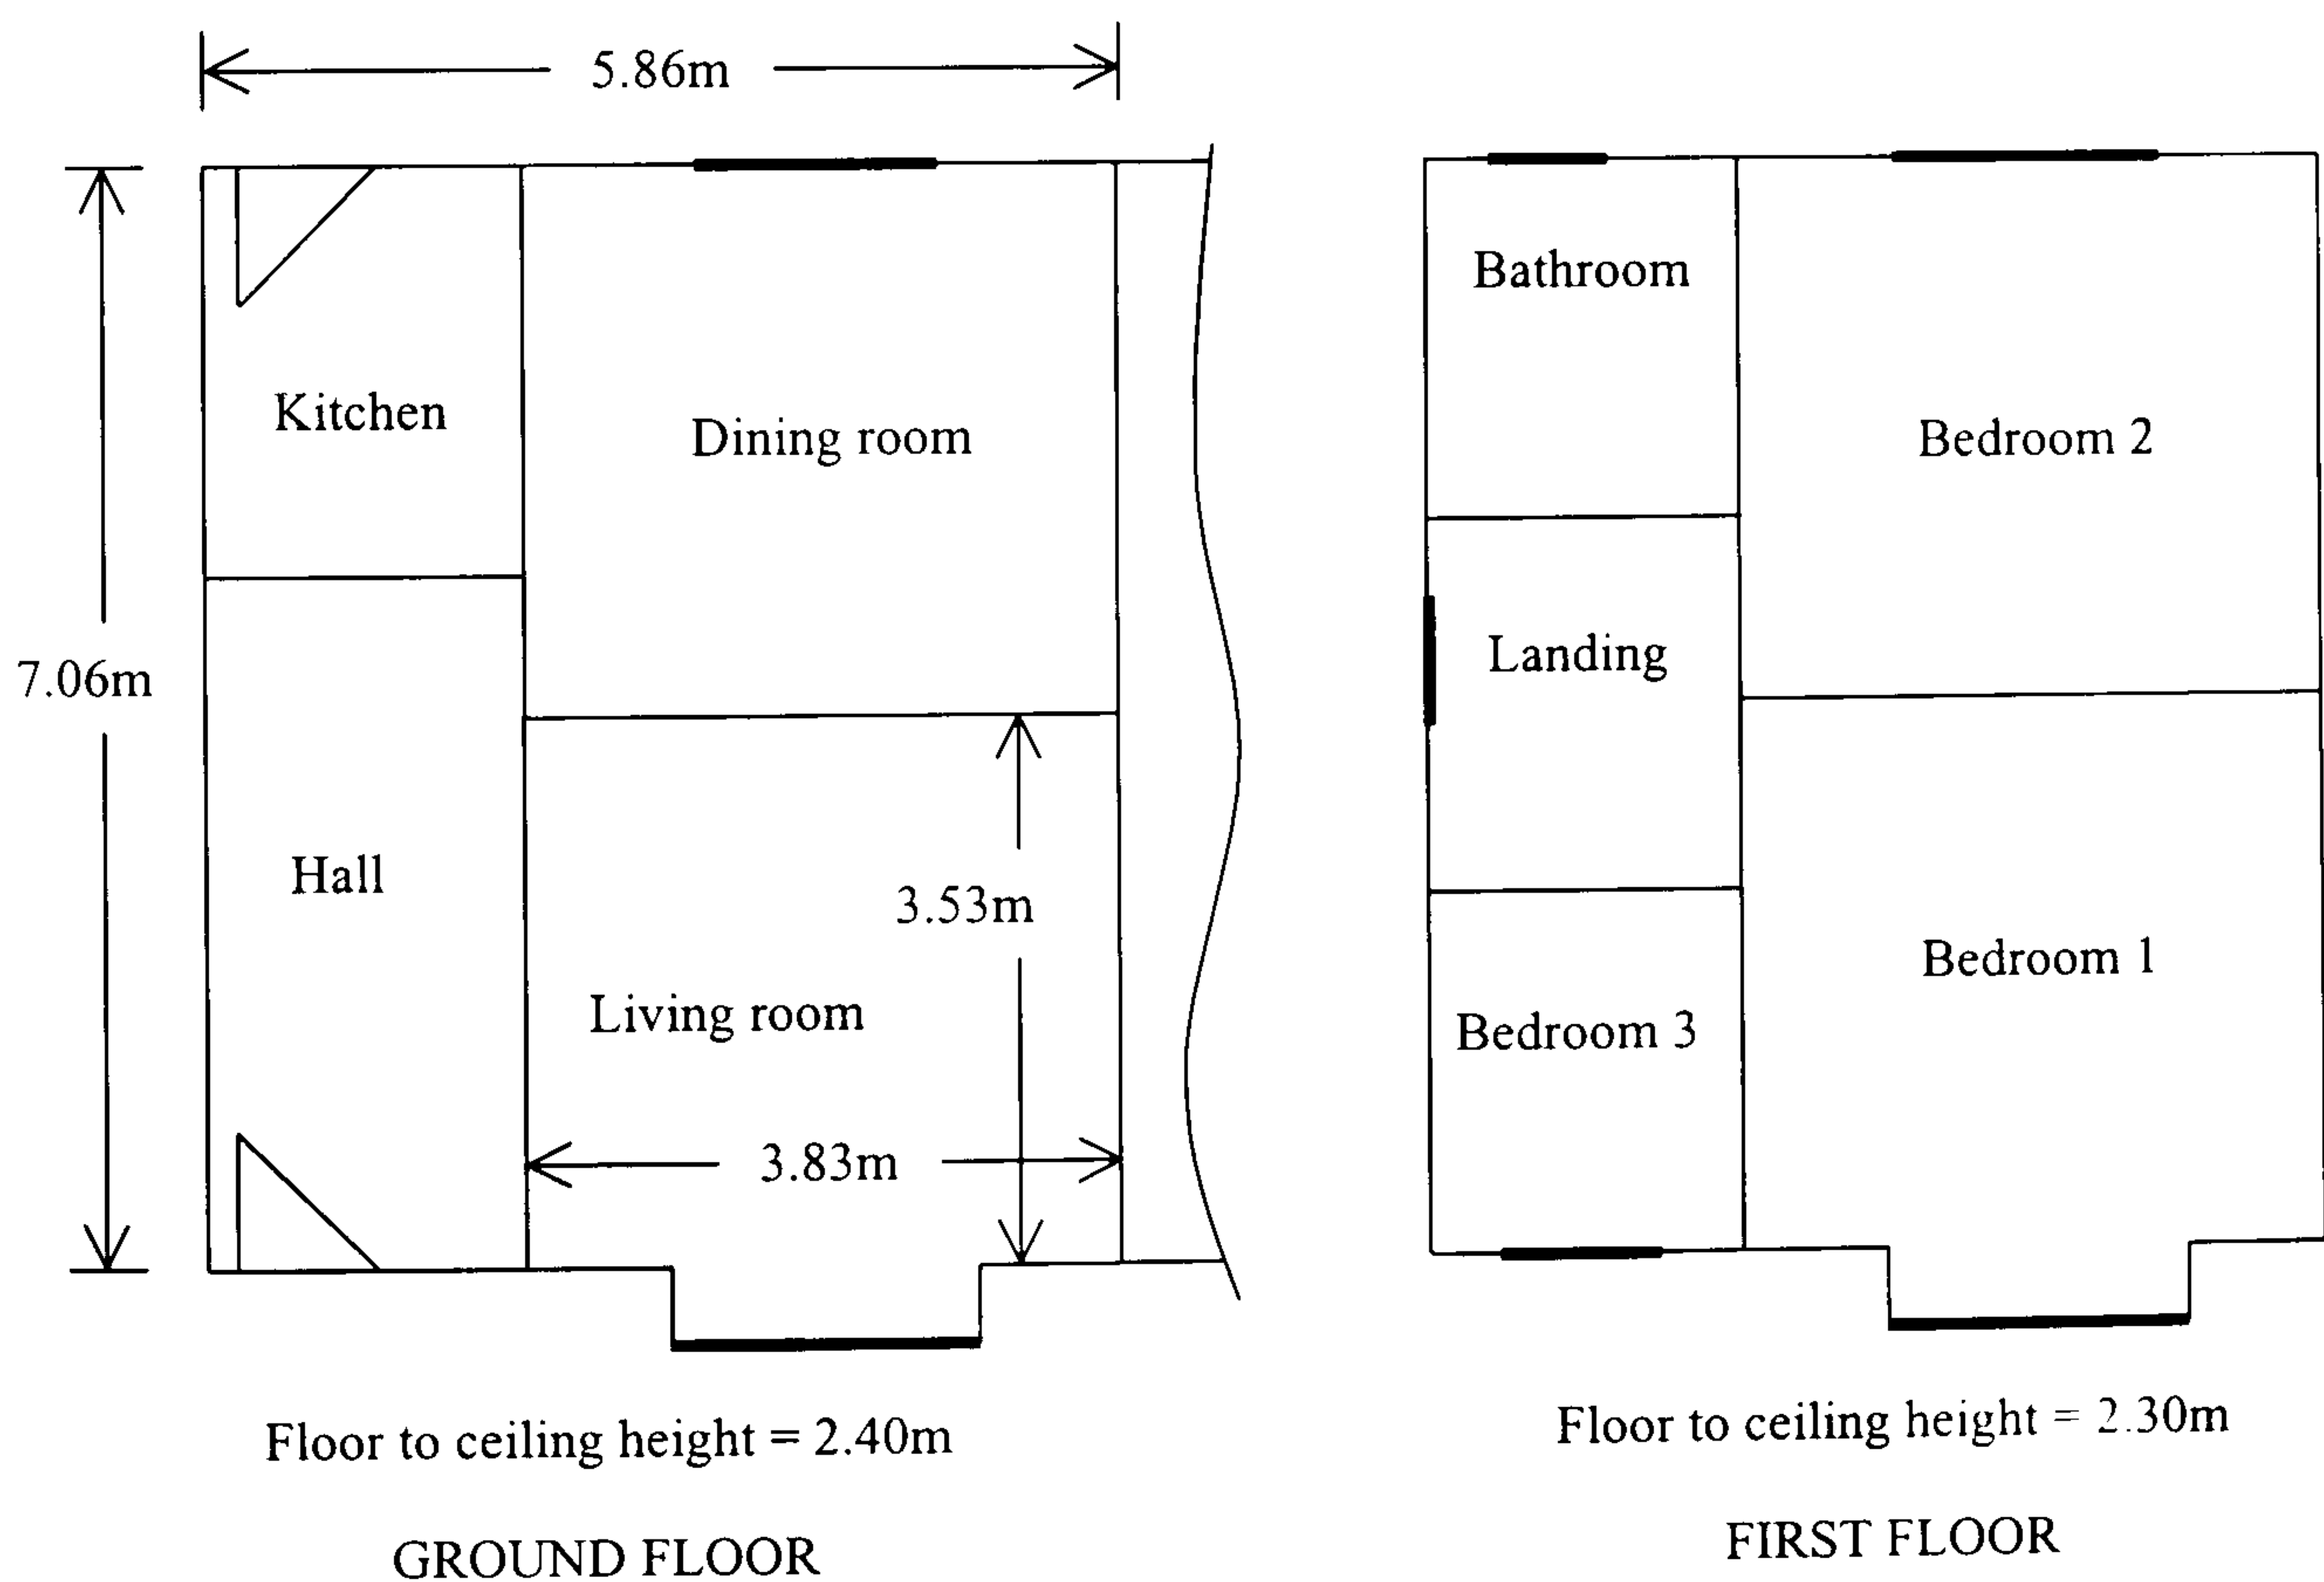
Semi-detached house plans. (Redrawn from Allen and Pinney, 1990.)
